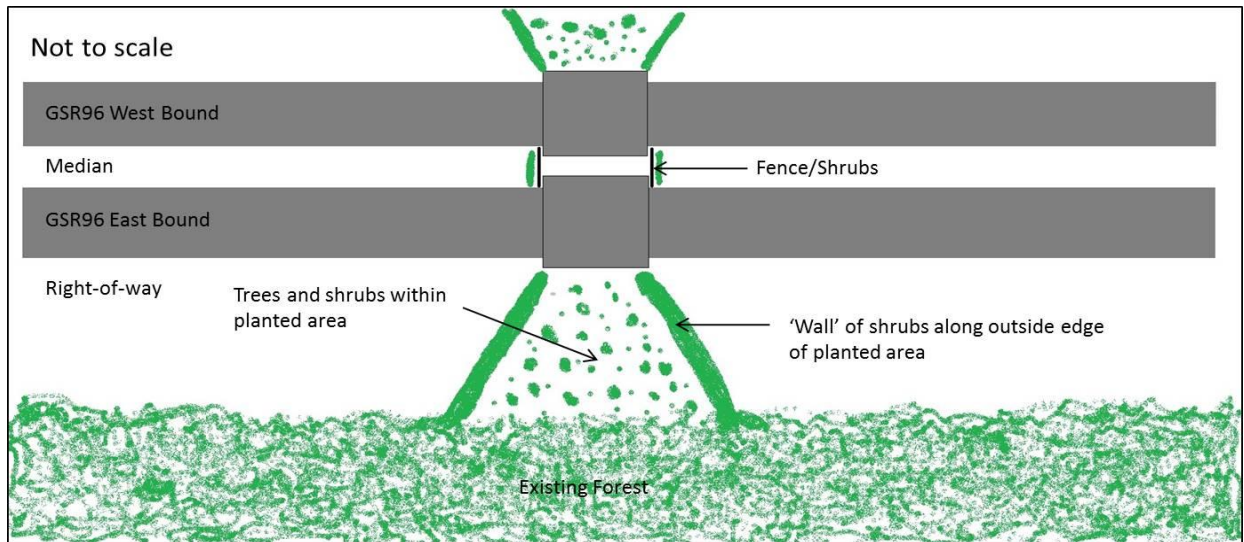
Proposed vegetation plan for wildlife underpasses, State Route 96 widening project, State Route 96, Twiggs County, Georgia, USA.
